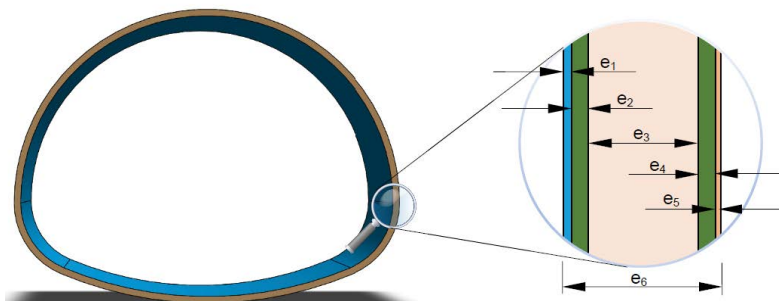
Structural layers of the wall GRP pipe with a non-circular profile; e_1 – inner layer – liner; e_2 – inner reinforcing layer; e_3 – core; e_4 – outer reinforcing layer; e_5 – outer protective layer; e_6 – total thickness of the wall [10].
